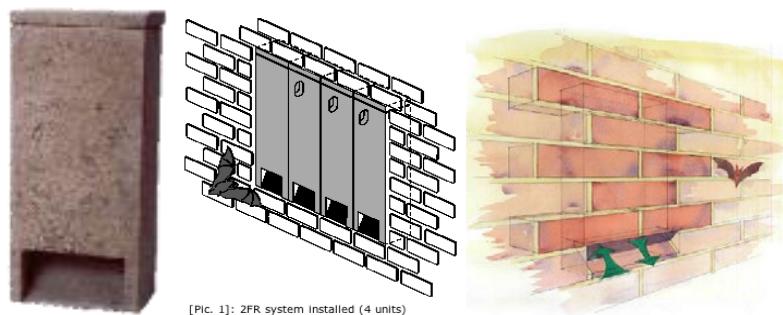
Bat tubes incorporated into the wall of a building to provide roosting space
